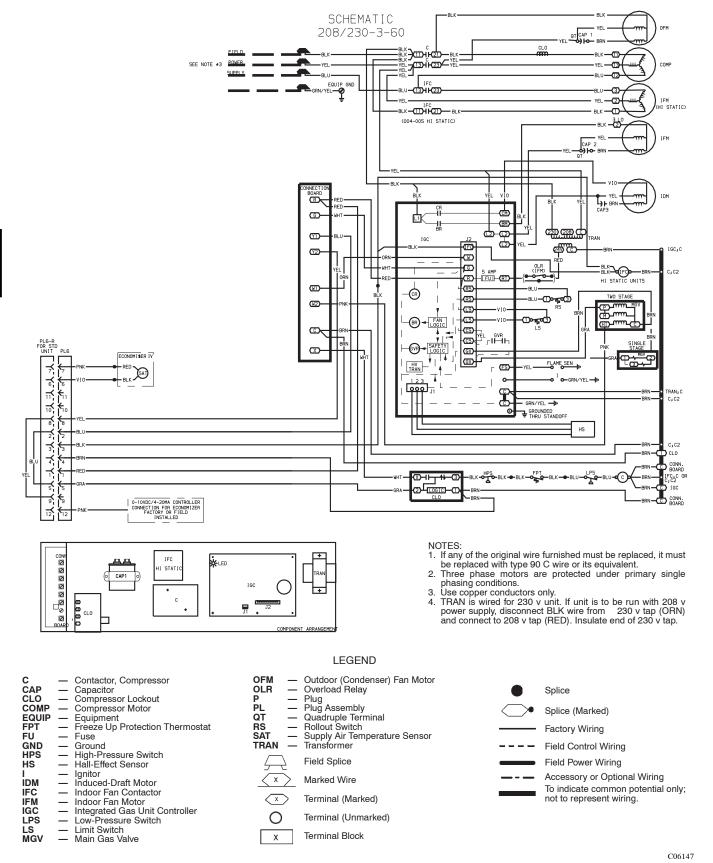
Typical Wiring Schematic and Component Arrangement (208/230-3-60 Shown)
